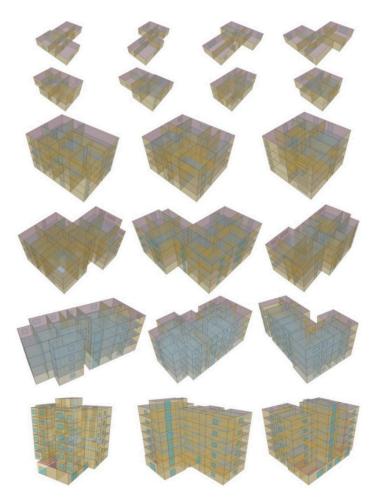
Examples of the generated buildings ranging from the single-storey family house to multi-storey mixed-use apartment buildings.
